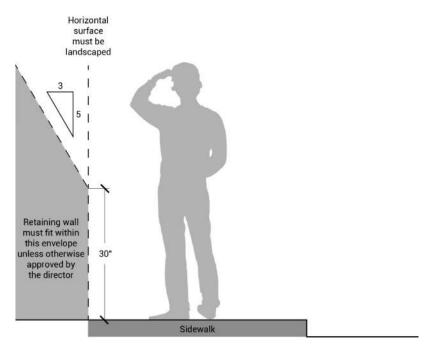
b. Allowed envelope for walls in street front setback.
